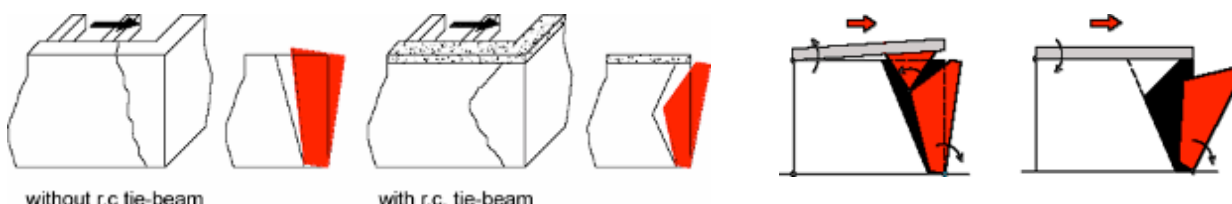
The presence of R.C. tie beams does not prevent the wall overturning but changes the shape of the damaged area, (Borri, 2004a).
